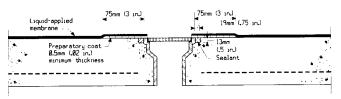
Termination at Drain with a Narrow Flange (see 10.4.2 and 14.6.2)
